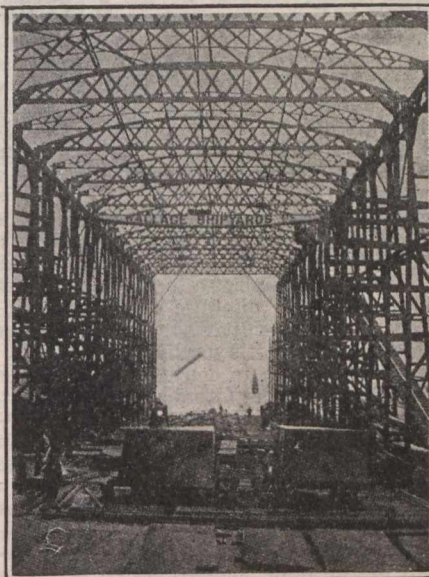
Steel shipbuilding at Wallace Shipyards, Ltd., North Vancouver.
